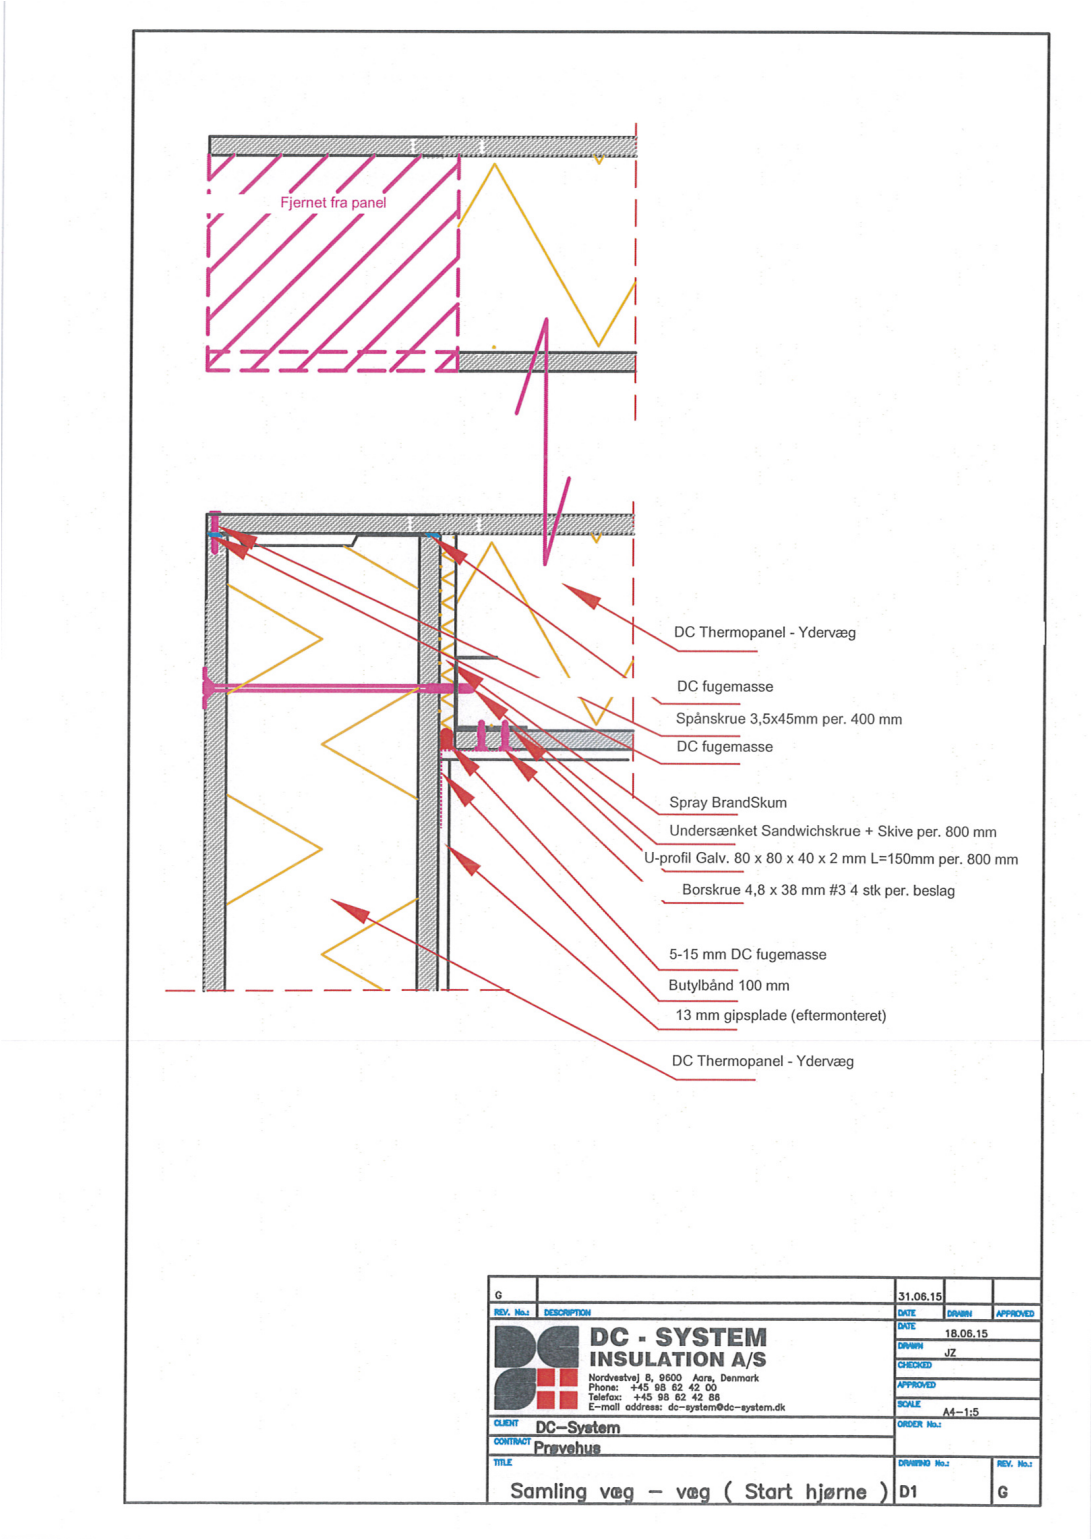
Detail: Wall-wall (corner). This joint was constructed with removed part of the cement board from the panel inside. [DC-System, Test House (2015)]
